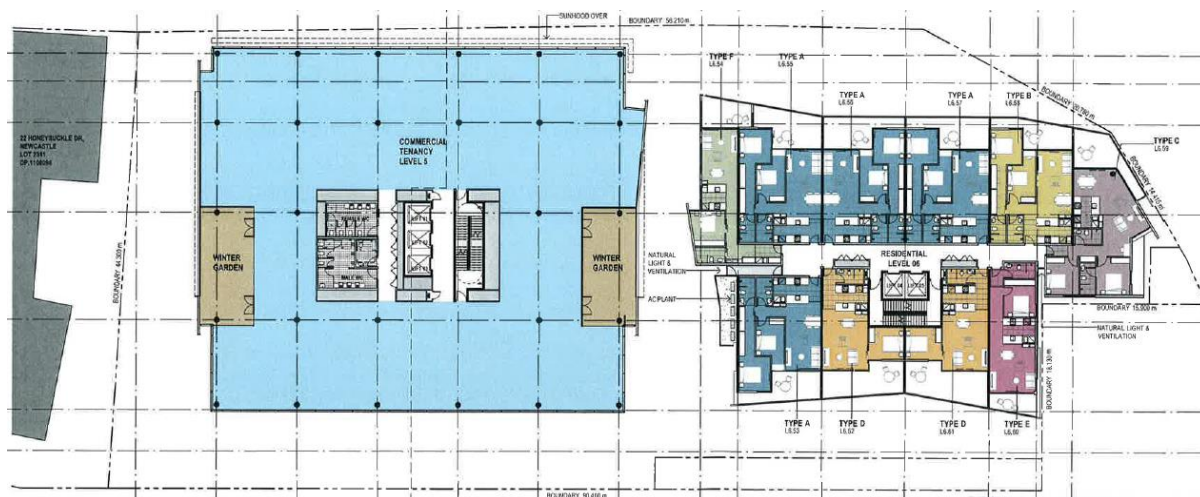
18 Honeysuckle Drive – Level 6 floor plan (NB: Commercial building to the west and apartment building to the east)
